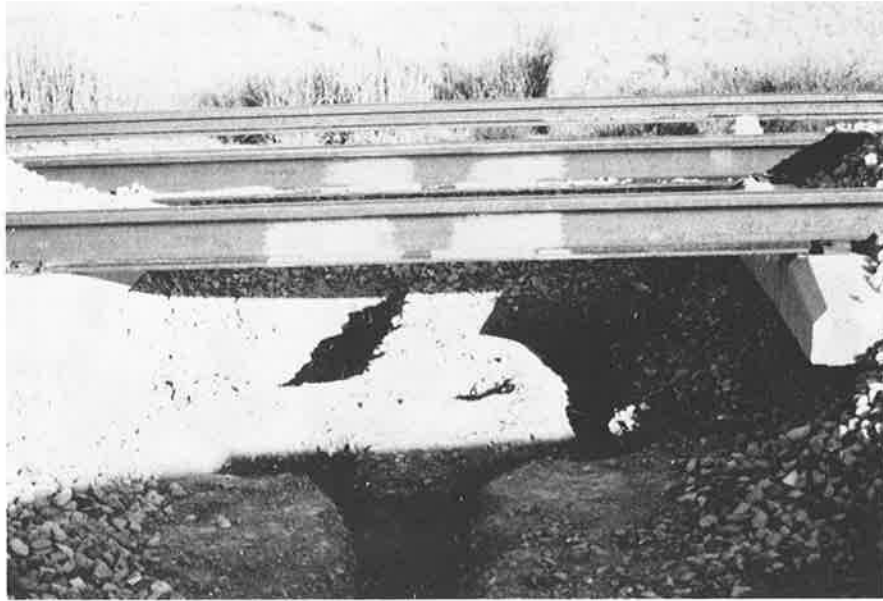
ROADBED TRENCHING PRIOR TO TRANSDUCER INSTALLATION
